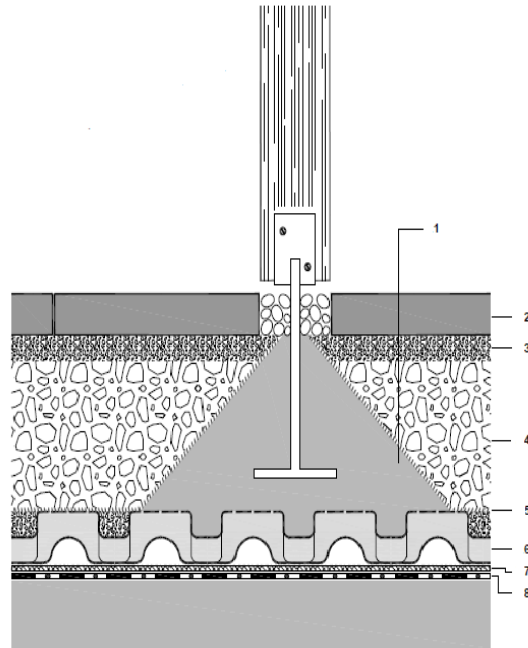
, 1.Concrete foundation for supporting structures.2 .Concrete paving slab.3 .Stone chippings, height (30 - 50 mm).4. Gravel base layer.5. Filter Sheet .6. Drainage Element 7.Protection Material .8. Roof construction with root-resistant waterproofing.
